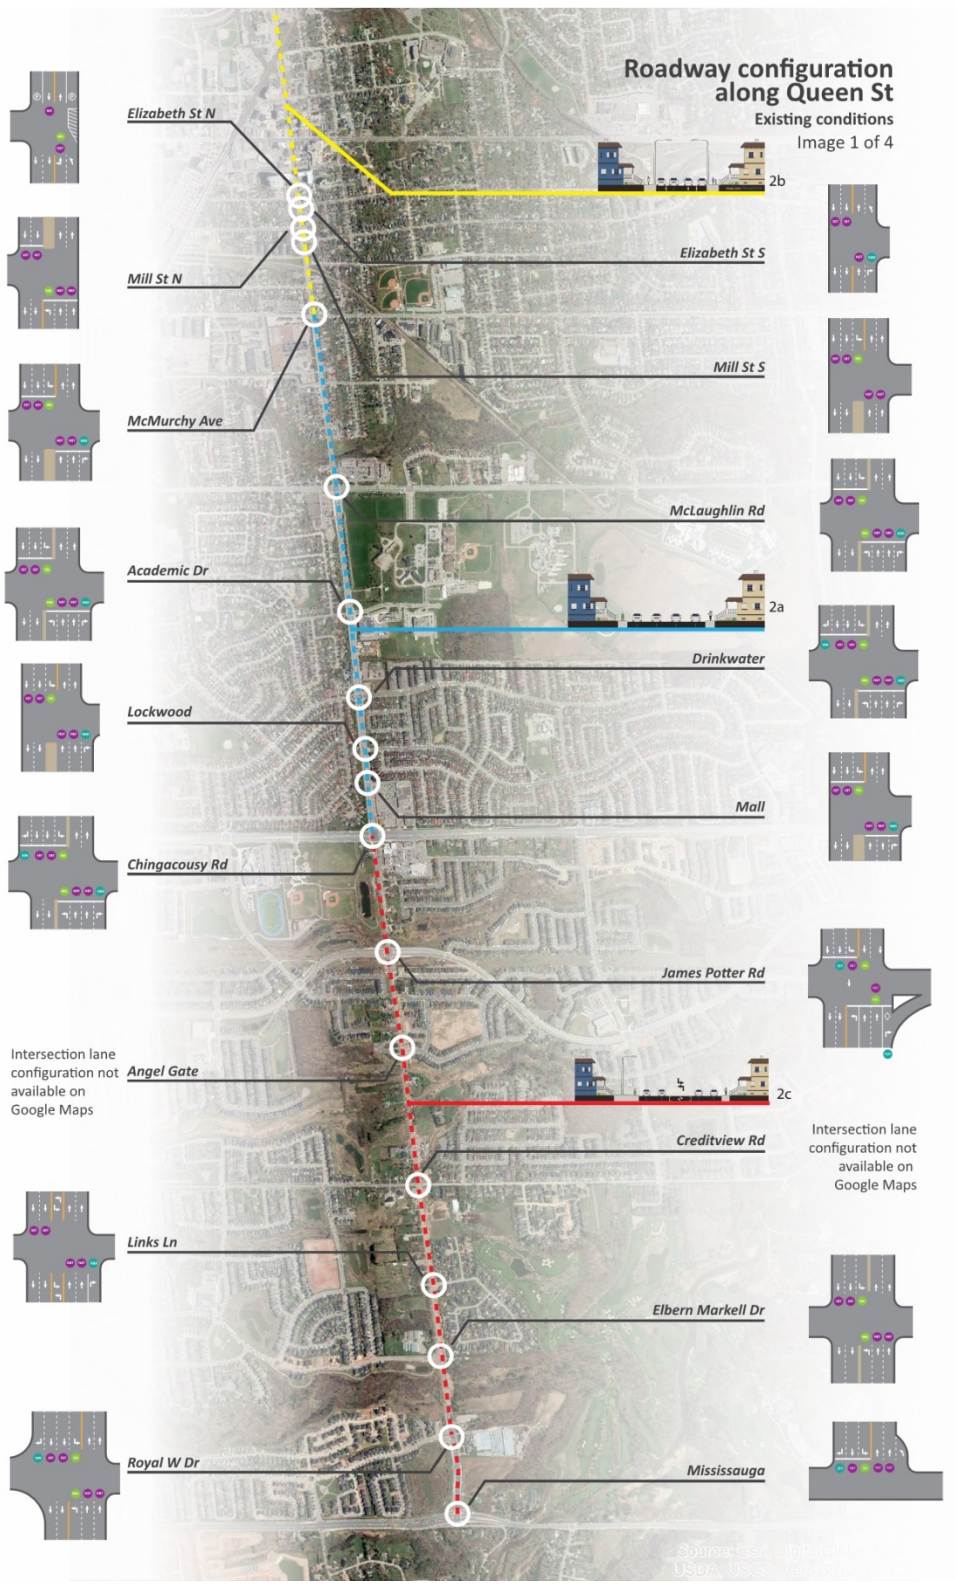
Roadway configuration along Queen Street, Mississauga Road to Mill Street North
